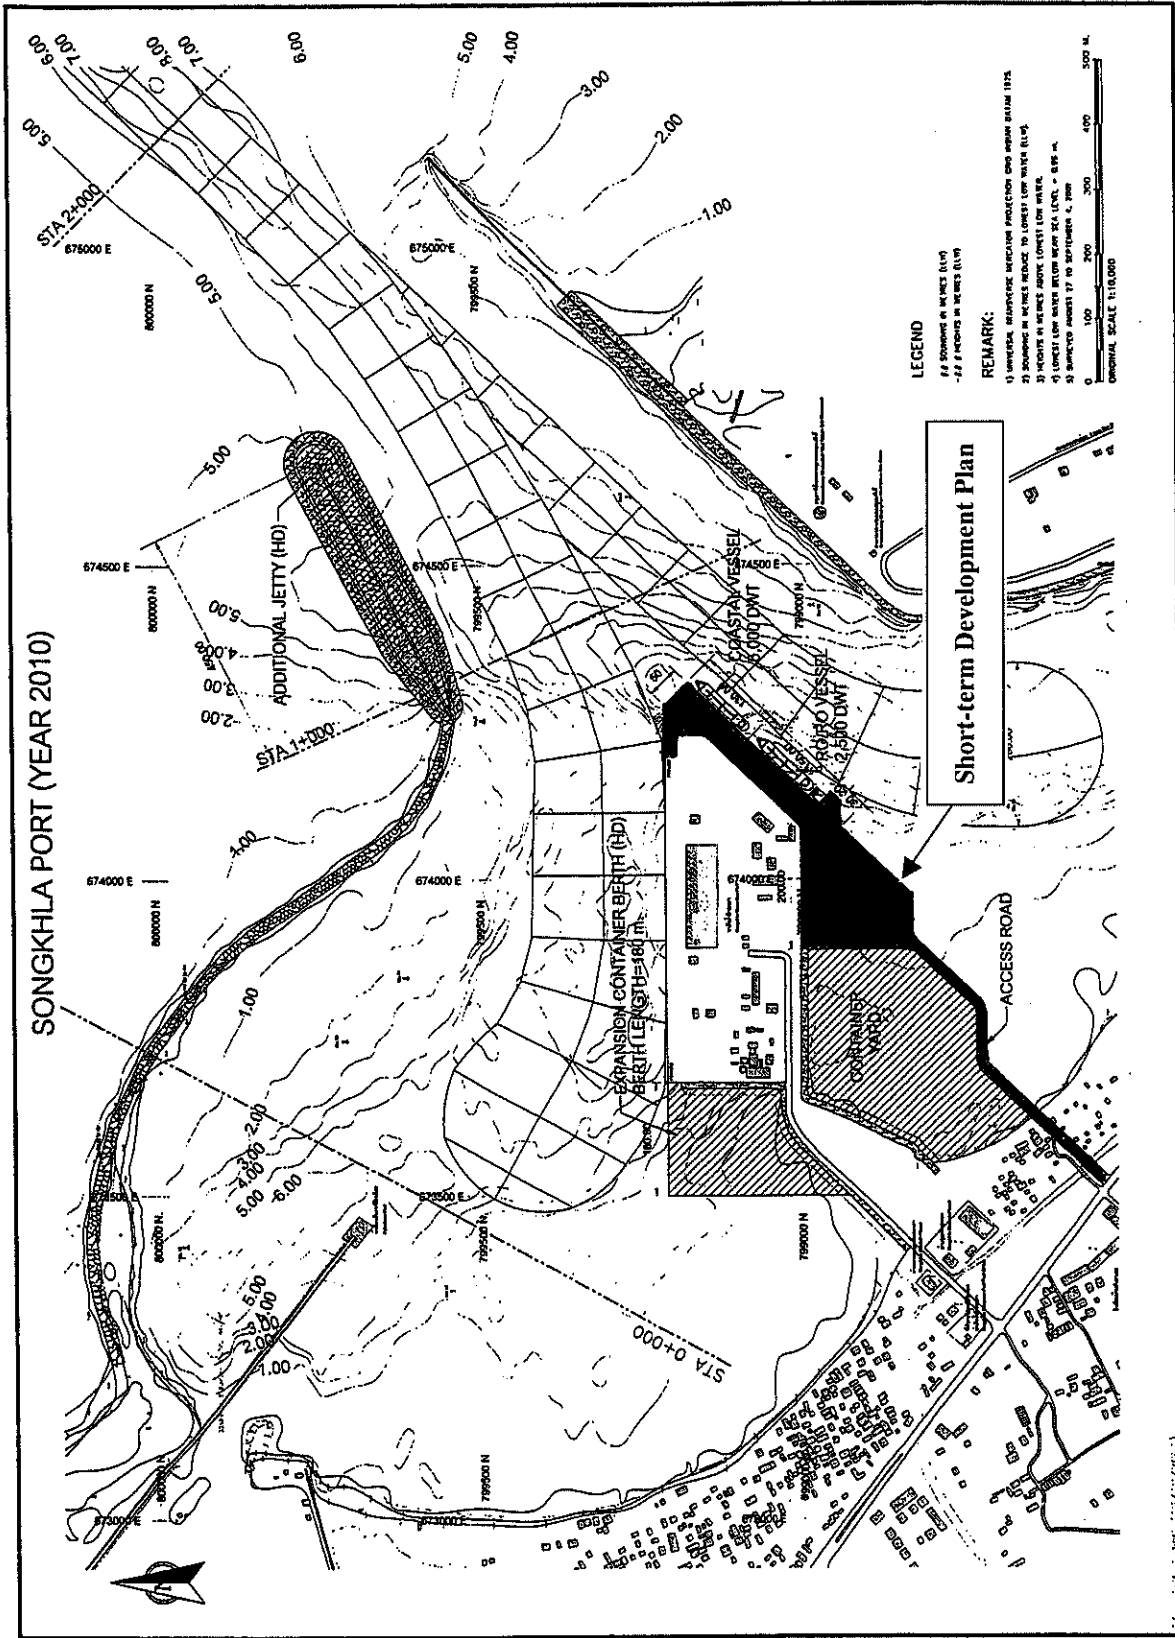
Short-term Development Plan of Songkhla Port
